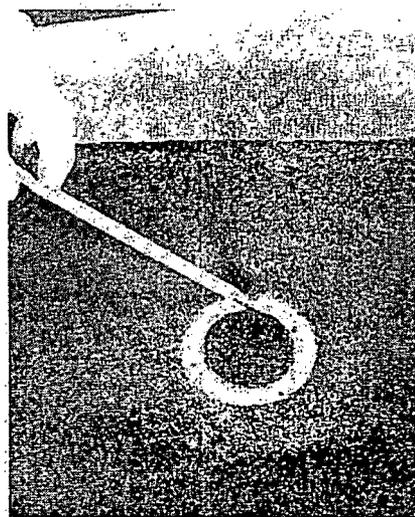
Cored disc after drilling and ready for the attachment of the pipe cap
